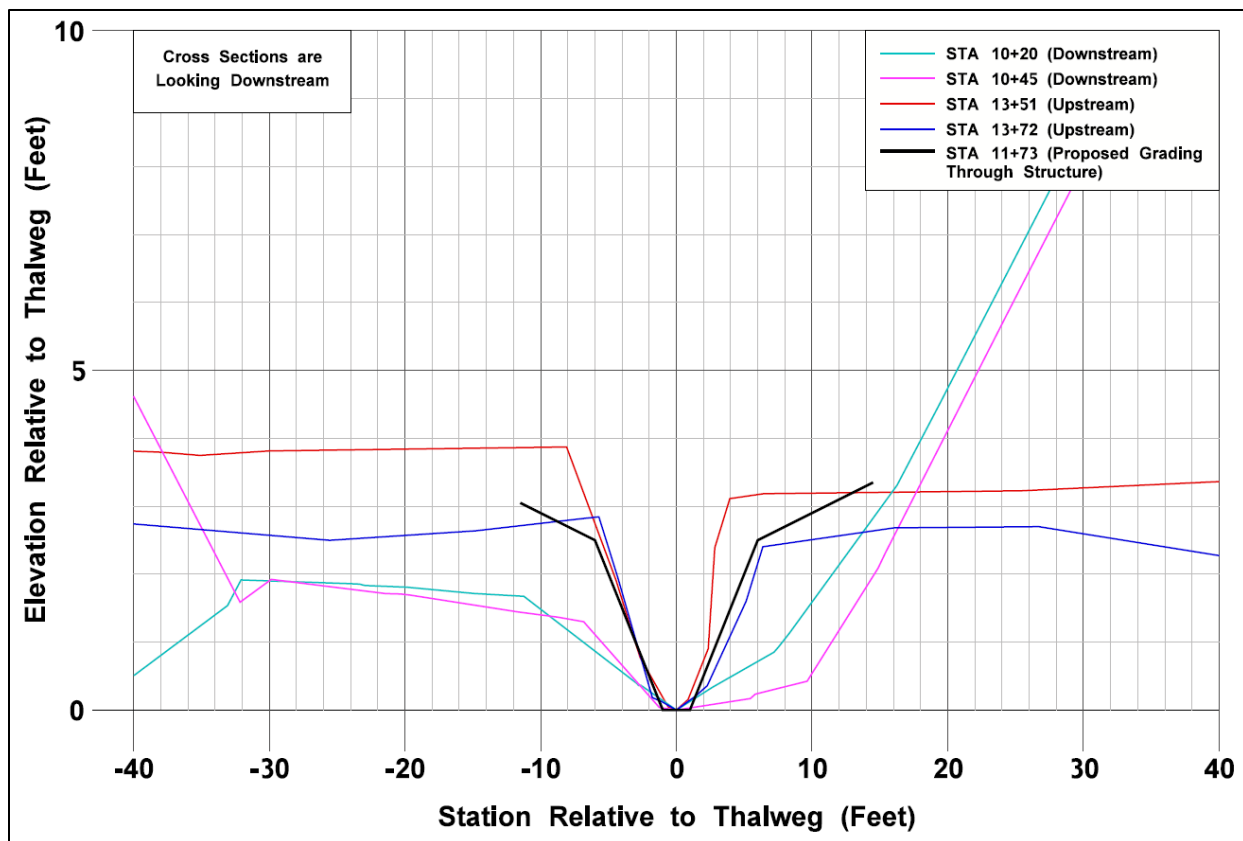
Proposed cross section superimposed with existing survey cross sections using proposed alignment stationing
